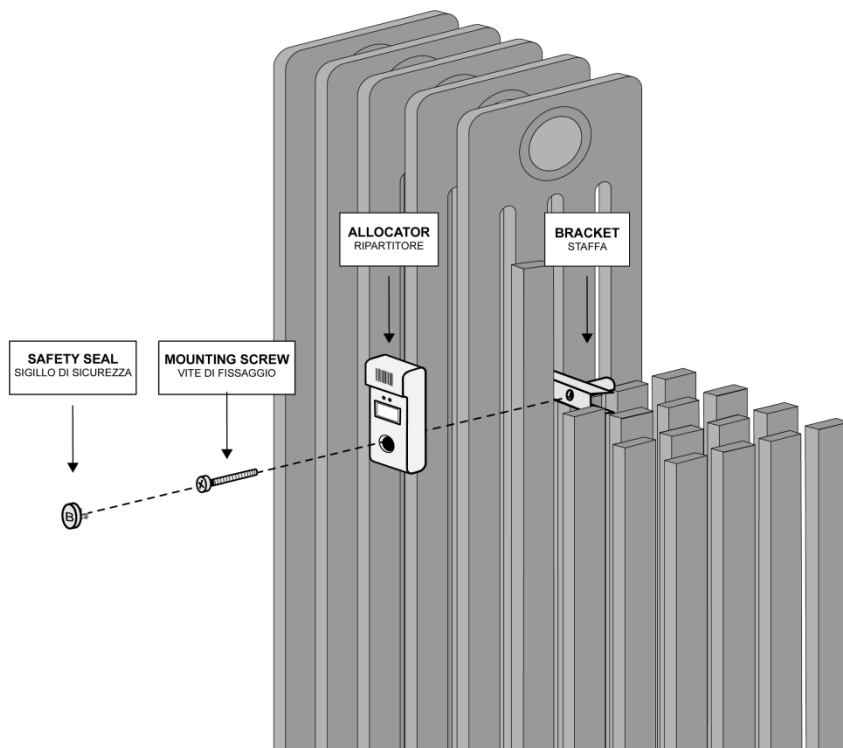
[Left side] How to mount the allocator in a ribs heater using the appropriate mounting brackets.
